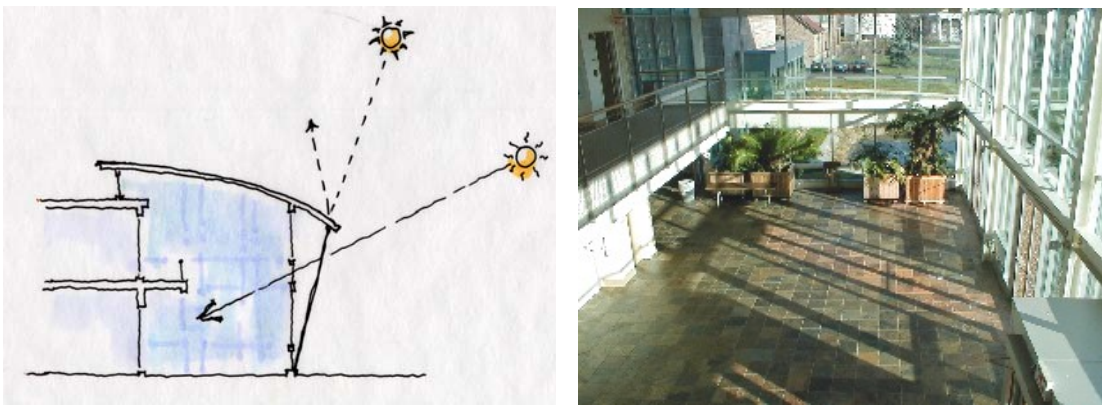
Section through the atrium and the view of atrium⁵. The east and south facing windows bring ample natural light into the generous two-story space. South facing glass wall has the overhang designed to prevent the harsh summer sun, yet allow the winter sun.
